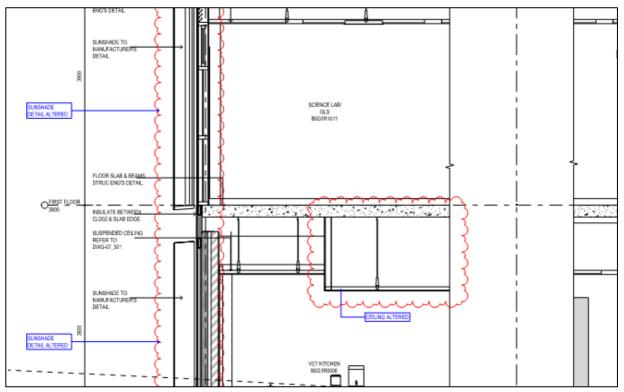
PROPOSED CEILING AND SUNSHADE
